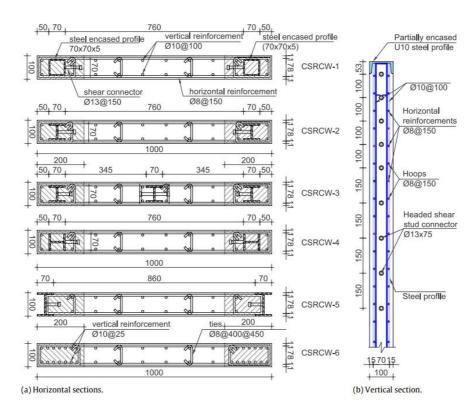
Details of wall specimens in Dan et al. (2011).
